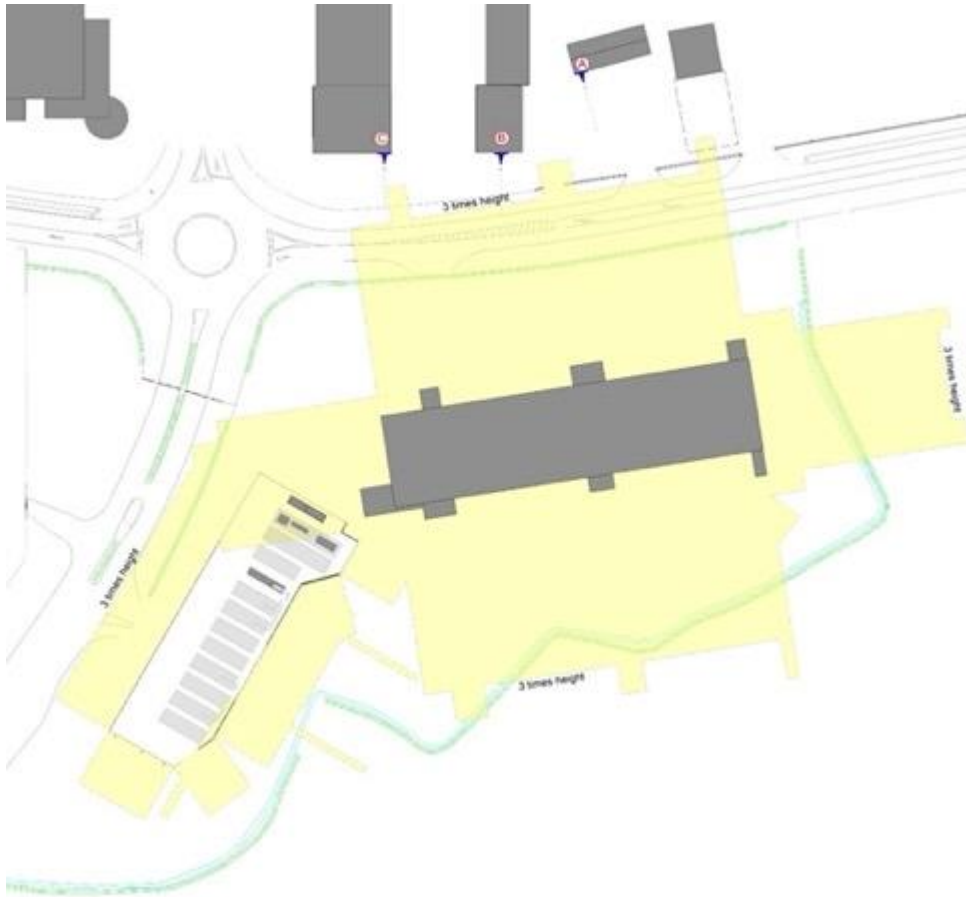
Proposed site plan showing the zone of influence from the Proposed Development and the direction of the window walls in relevant properties.
